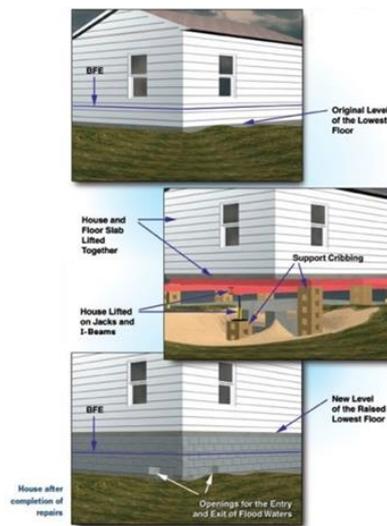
TECHNIQUES FOR ELEVATION (FEMA, 2000)
